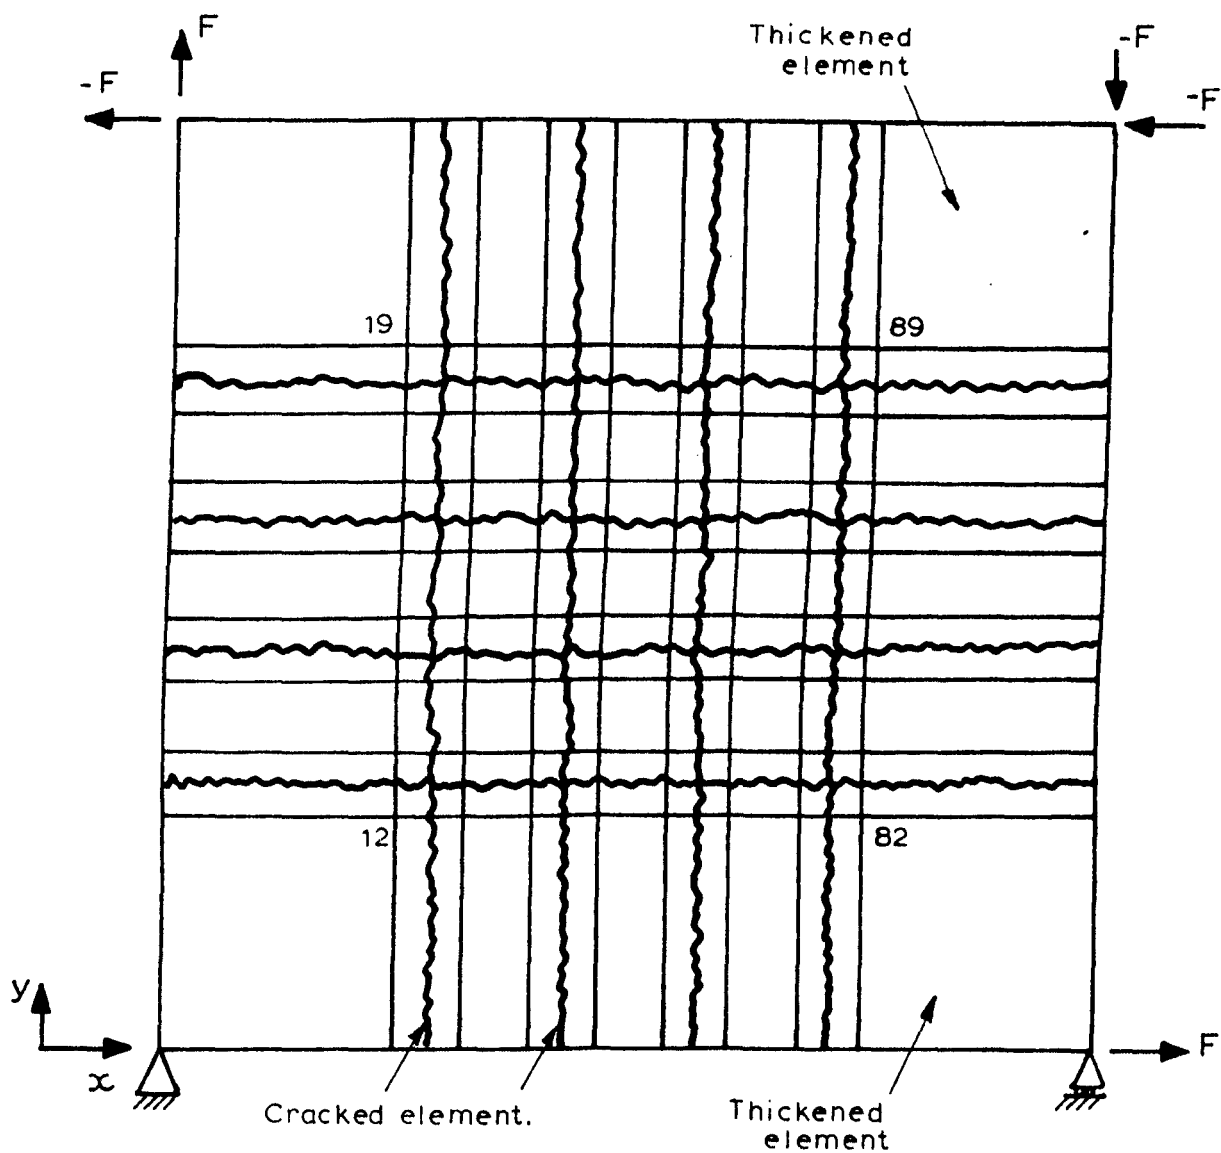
FINITE ELEMENT MODEL OF SLAB TESTED IN [37]
